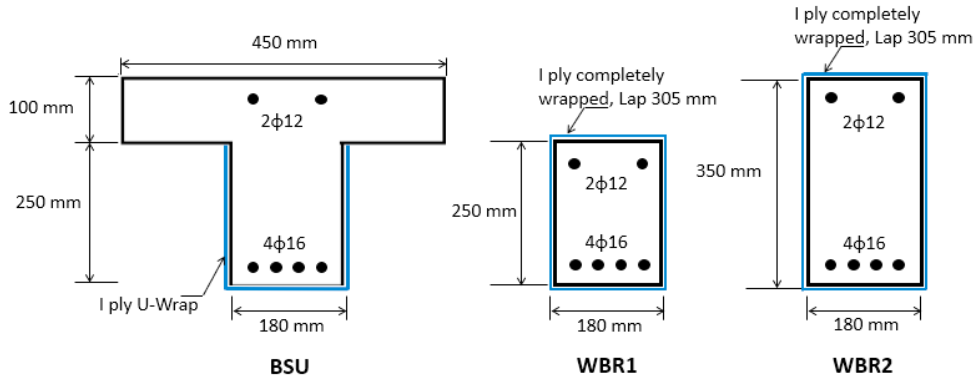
Cross-section detailing of strengthened specimens in the strengthened shear span.
